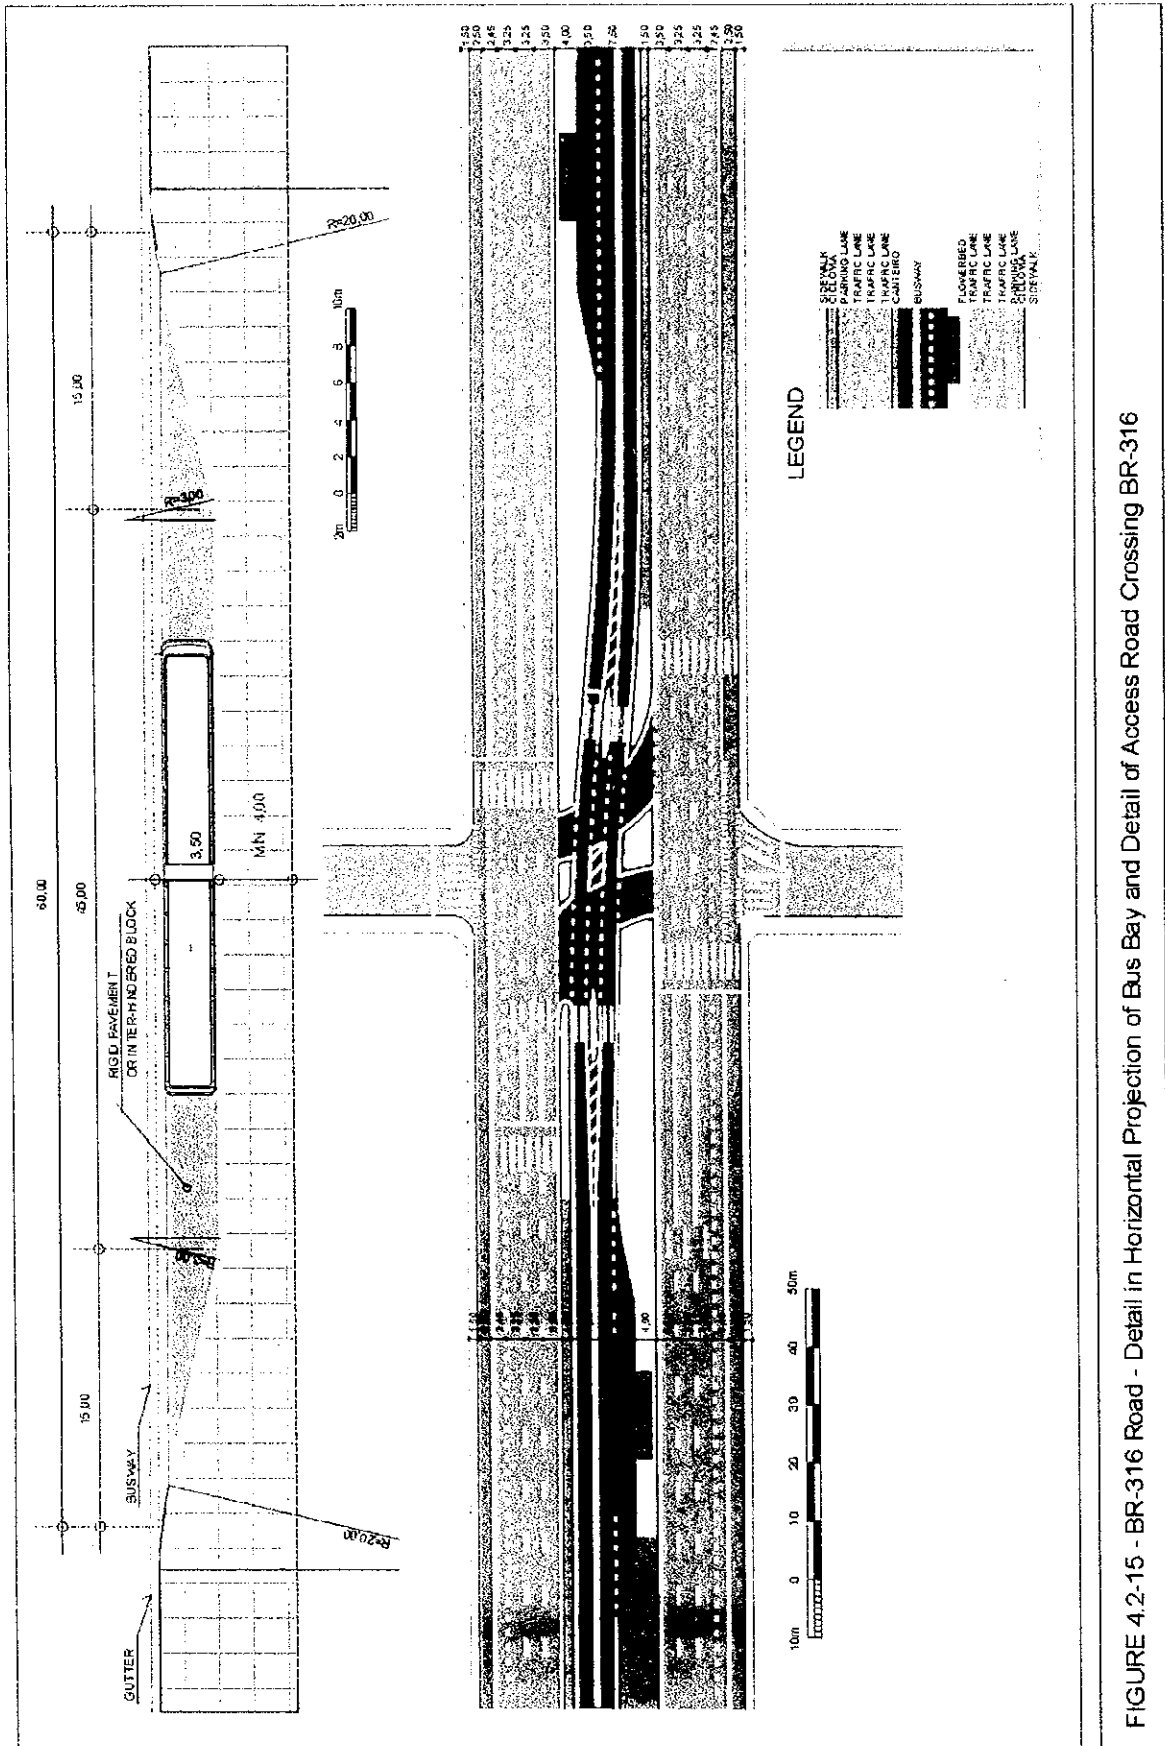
BR-316 Road - Detail in Horizontal Projection of Bus Bay and Detail of Access Road Crossing BR-316
